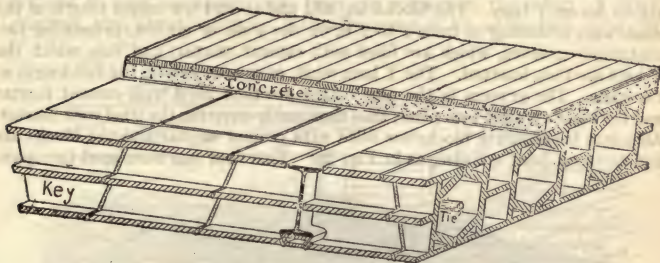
Johnson End-construction Tile Floor-arch. Original Form
